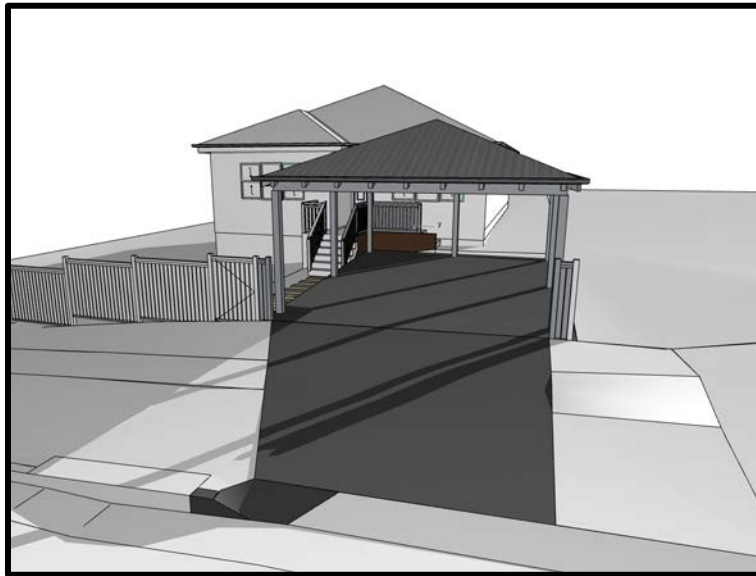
Proposed works at No. 68 Collaroy Plateau shown in colour. (*Action Plans 2020*).
